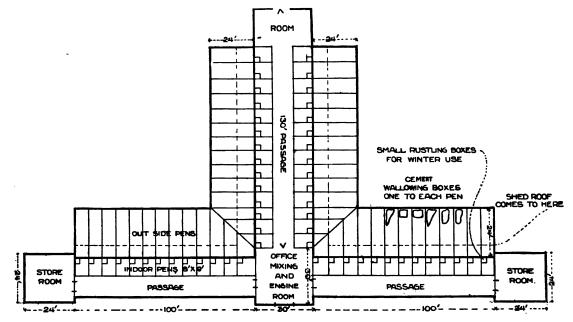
MORGAN HOG BARN (FLOOR ARRANGEMENT).
